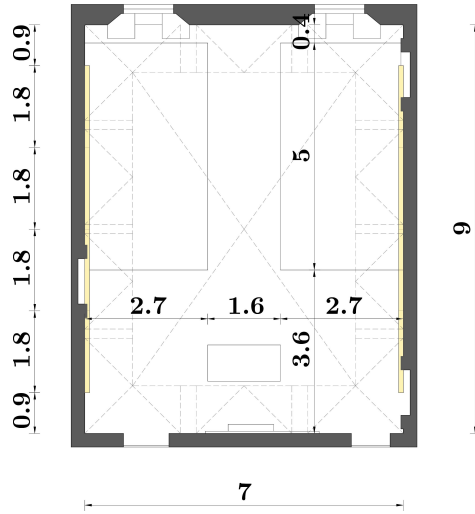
Case B plan; height of the luminaires at 3.80 m.
